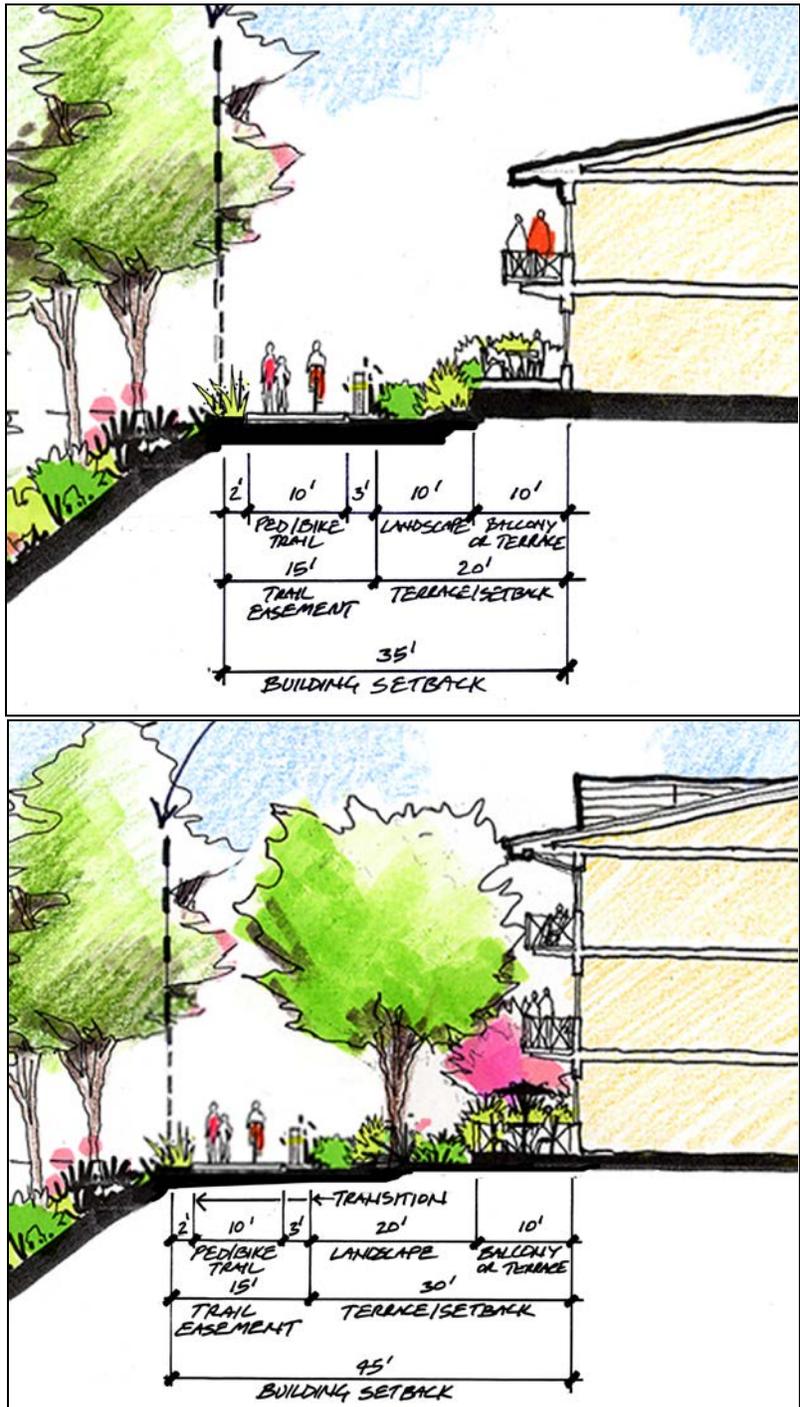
Minimum building setback requirements inside the Willamette River Waterfront Zone.
